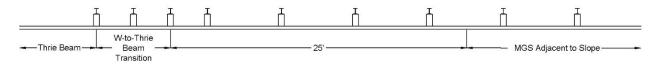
MGS Adjacent to Slope Offset from W-to-Thrie Beam Transition
